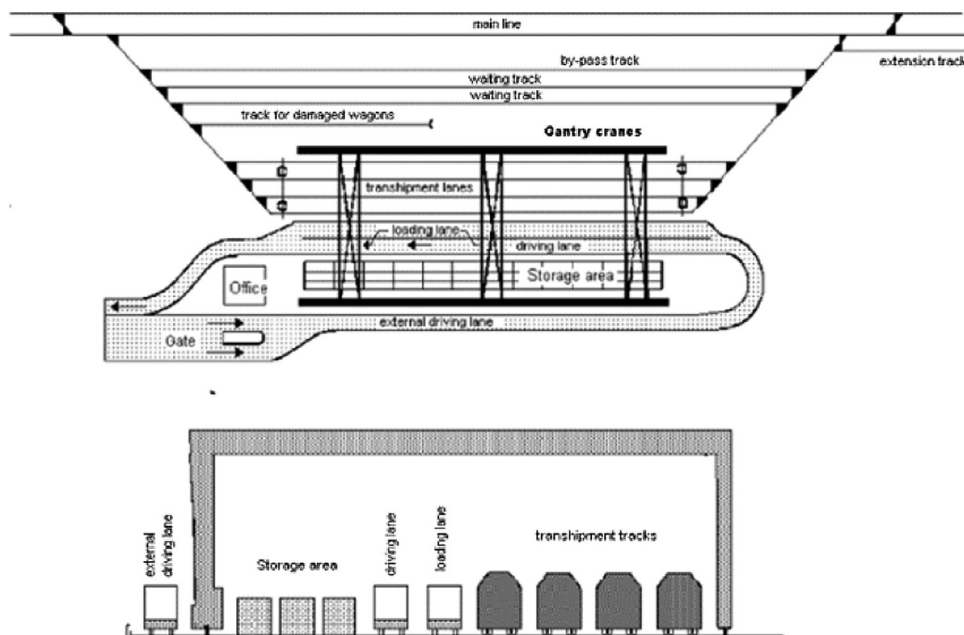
Layout and cross-section of the rail-road terminal equipped with three gantry cranes [19].
